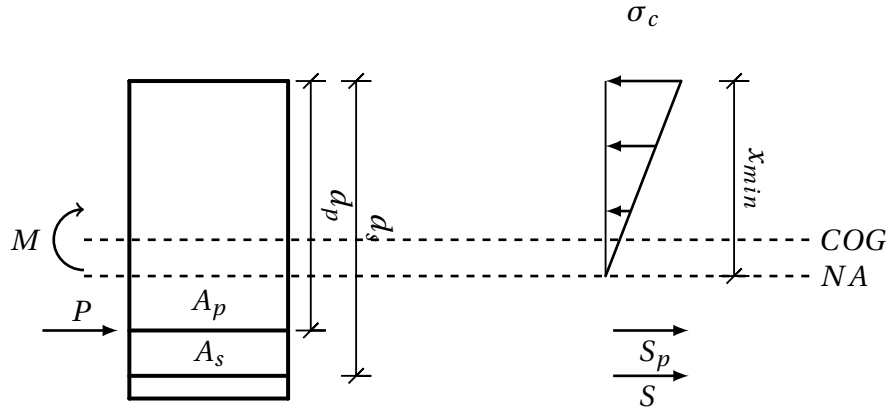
Controlling cracking by combining the use of ordinary and prestressed reinforcement.
